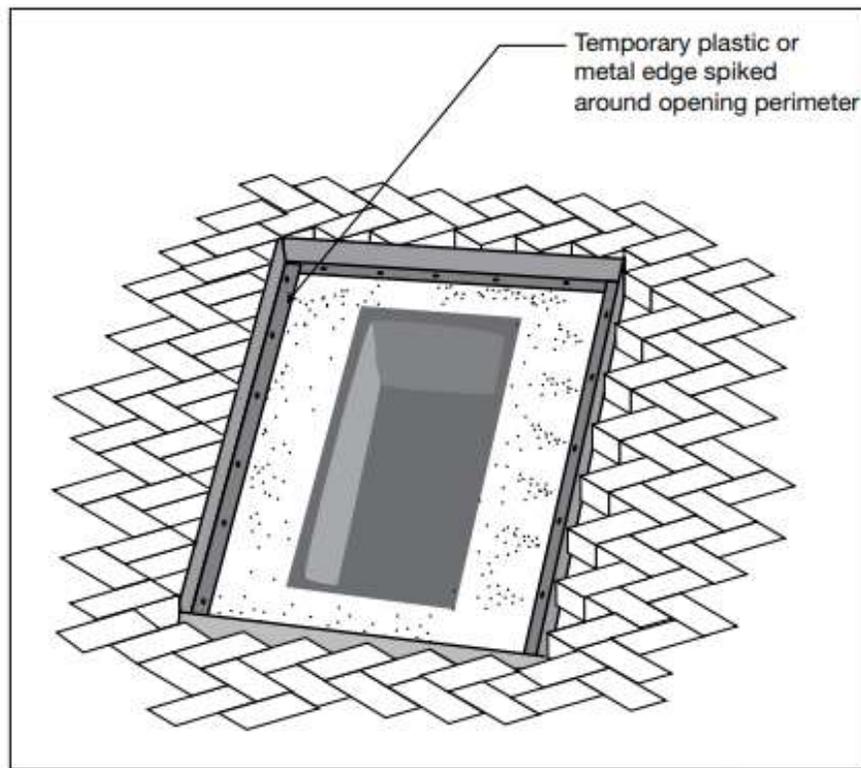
Temporary bracing at the pavement opening will help keep units in place during excavation, repairs and reinstatement.
